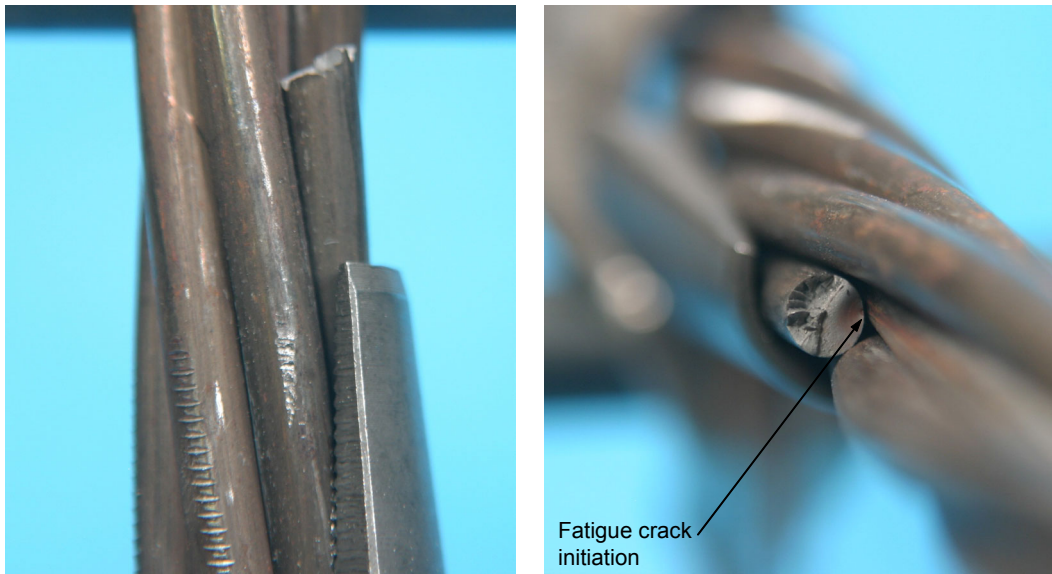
Wire break on strand 11 near wedge on the deck end - Specimen 8
